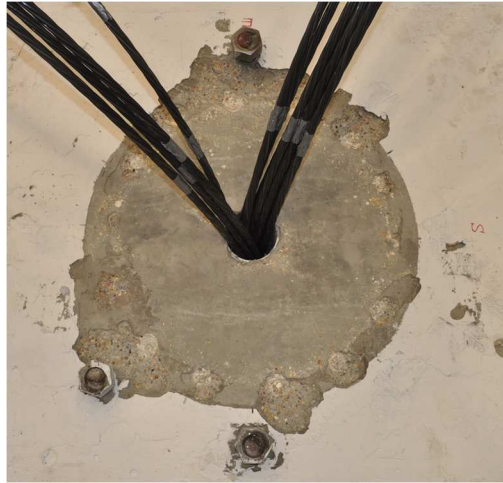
Damage in the foundation at the location of longitudinal rebar of the RC rocking column.
